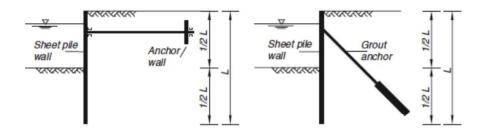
Sheet pile wall structures: anchored sheet piles (De Gijt & Broeken, 2013)
